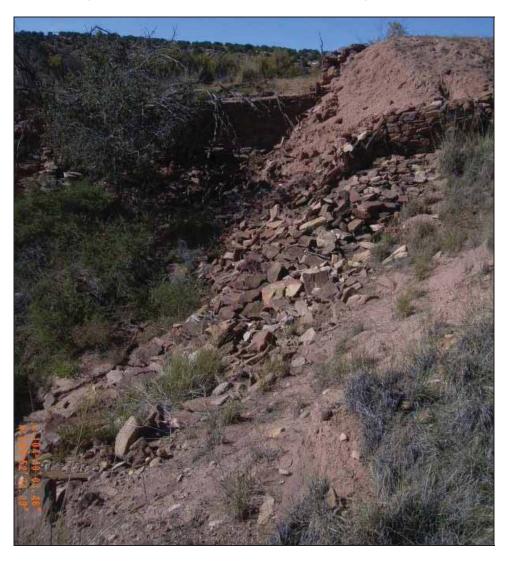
Remnants of masonry armoring river bank, facing west toward earthen berm and diversion wall.
